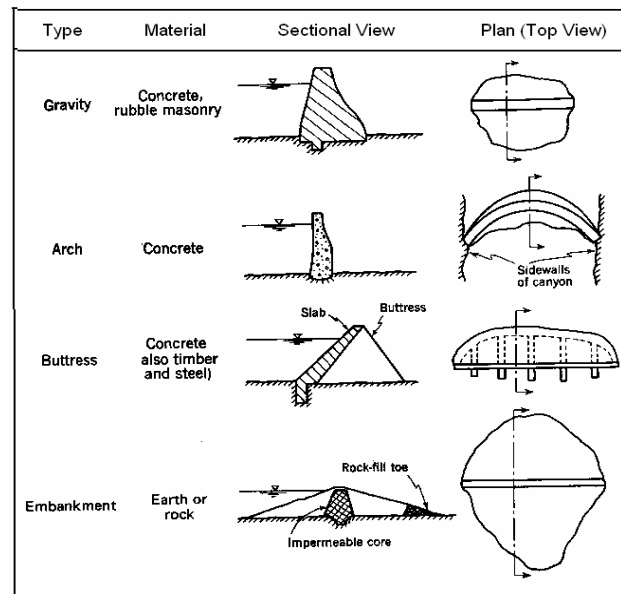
Typical cross-sections of each type of dams (adapted from (Prasiddha, 2015))
